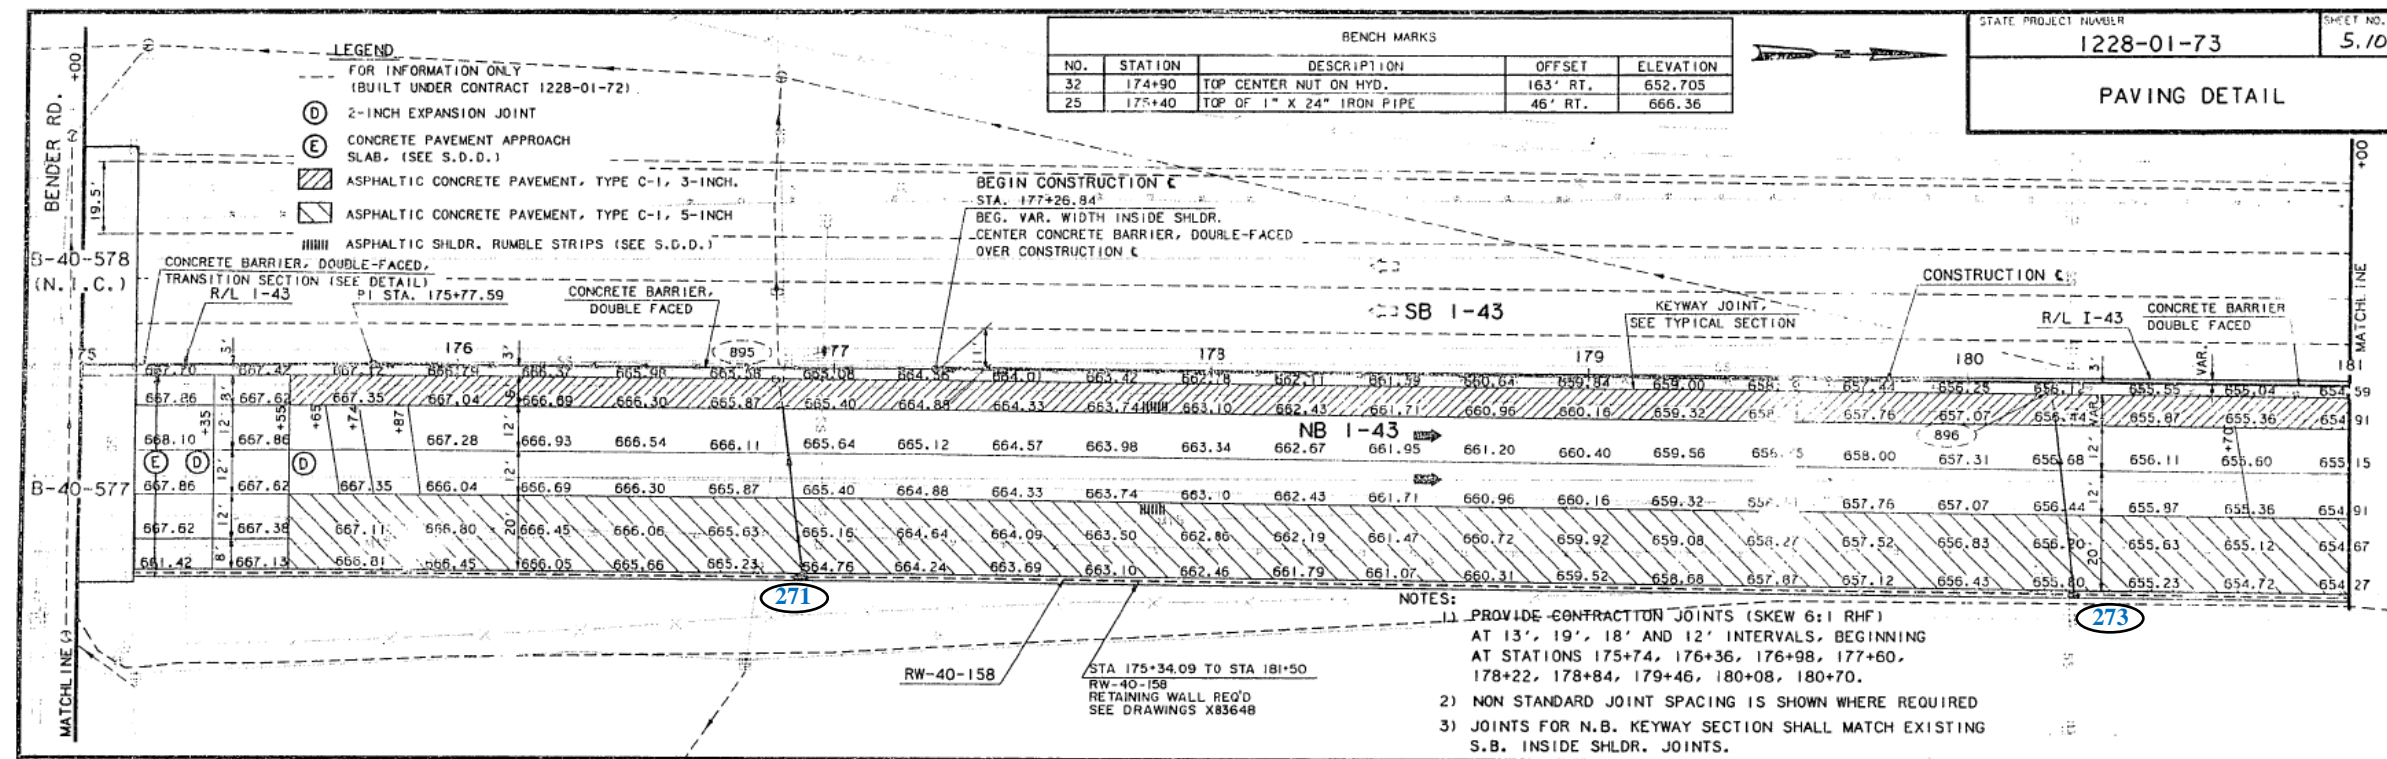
Design drawings for structure B-40-577 located at the south end of the MSE wall.
